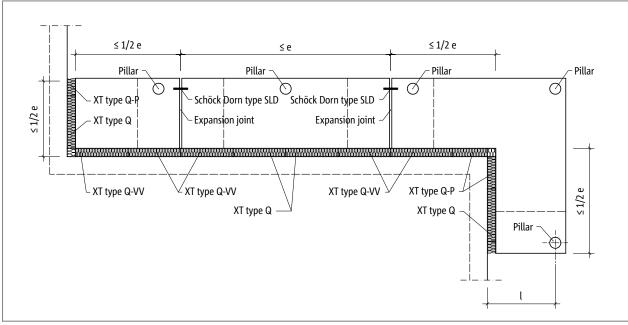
Schöck Isokorb® XT type Q-P, Q-P-VV: Expansion joint arrangement
